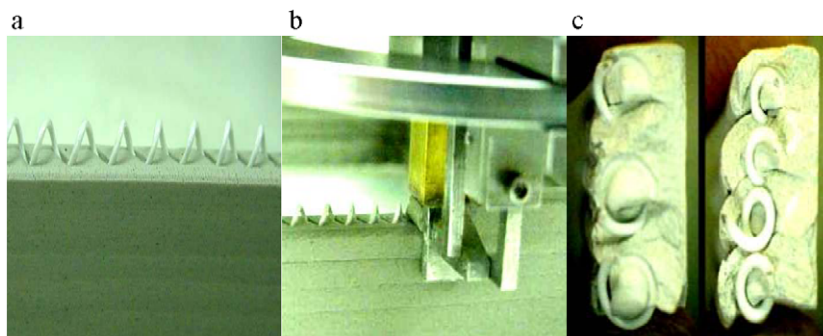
Reinforcement process of CC: (a) metal coil placed on a top layer, (b) a fresh layer of extrudate covers the coil and (c) cross sections of the fabricated part with the reinforcement coil showing a reasonable adhesion between layers.
